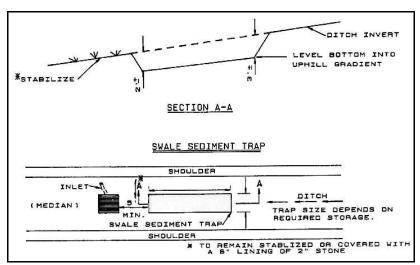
Swale outlet sediment trap details (Empire State Chapter Soil & Water Conservation Society, 1991).
